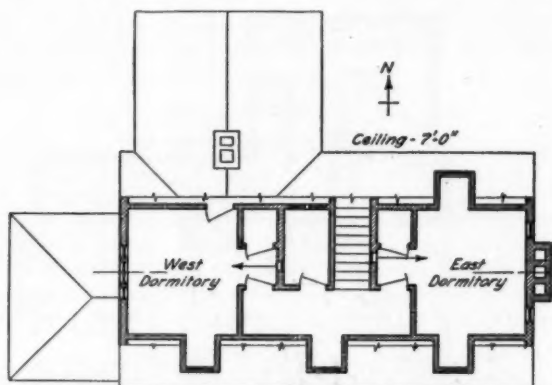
THIRD FLOOR PLAN WITH LOCATION OF WARM-AIR REGISTERS
